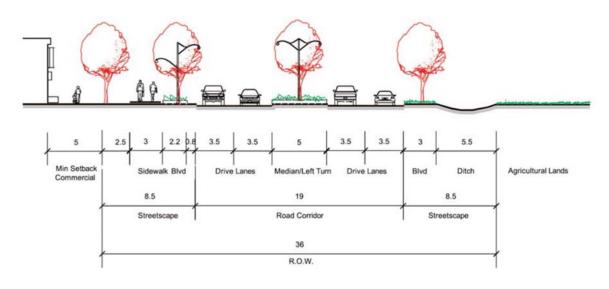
WOODBINE AVENUE, KSP PROPOSED CROSS-SECTION
